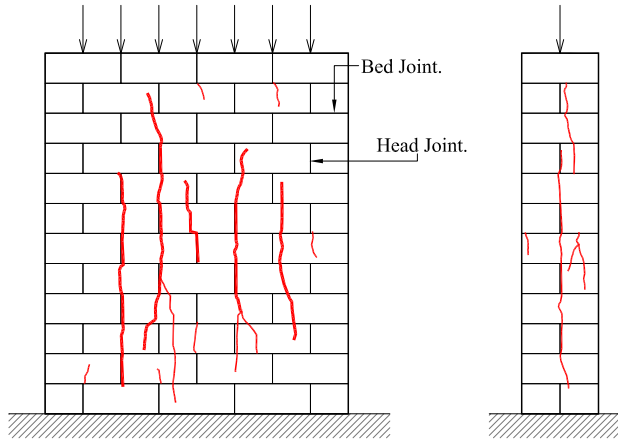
Typical failure mode of masonry under compression loading.
